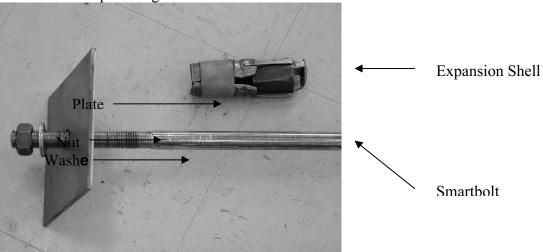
A photograph showing a close-up view of a 1.5m long smartbolt, washer, nut, expansion shell and plate.
